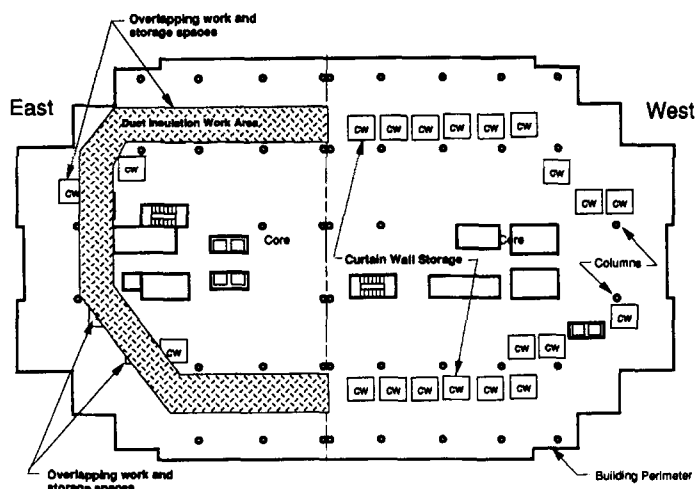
Floor Layout Plan—Interference between Duct Insulation and Curtain Wall Storage (cw)
